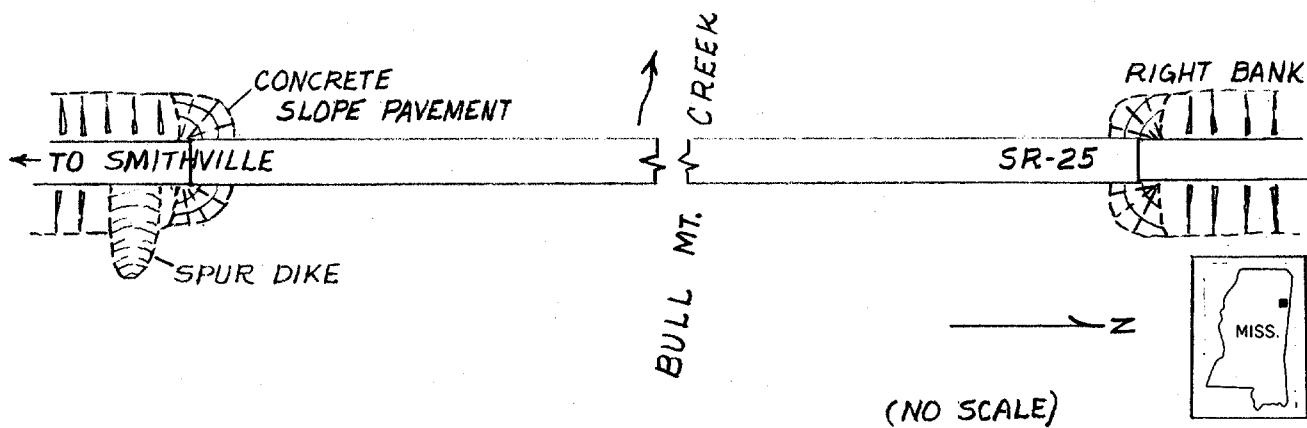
Plan sketch of SR-25 crossing at Bull Mountain Creek.
